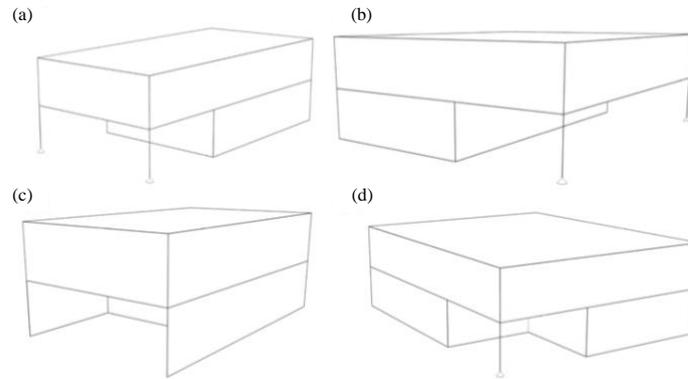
Schematic isometric views highlighting different first story SWOF wall line layouts: (a) L1, (b) L2, (c) L3 and (d) L4
